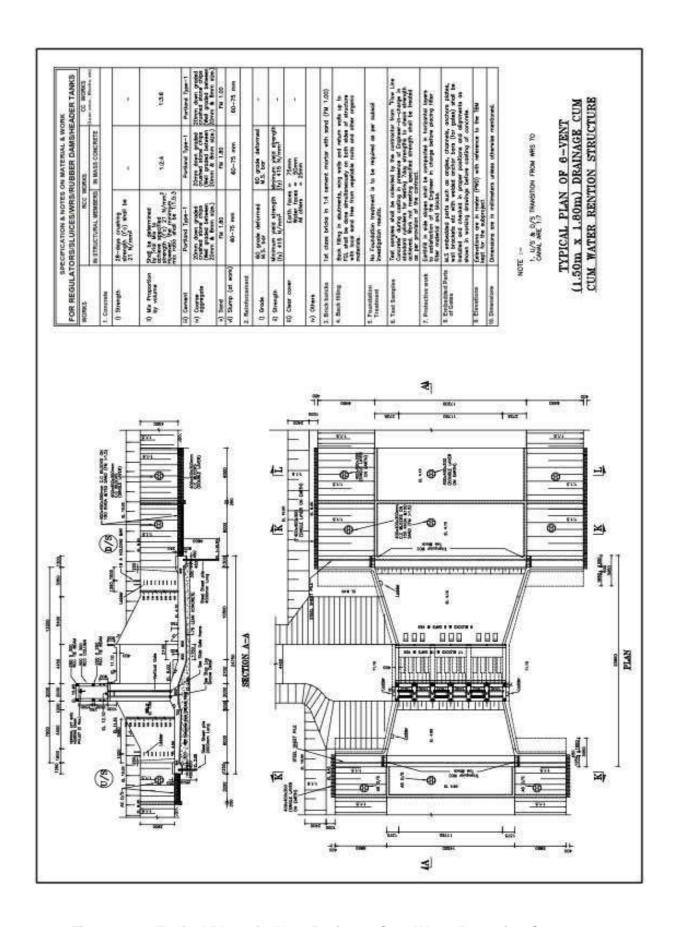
Typical Plan of 6-Vent Drainage Cum Water Retention Structure
